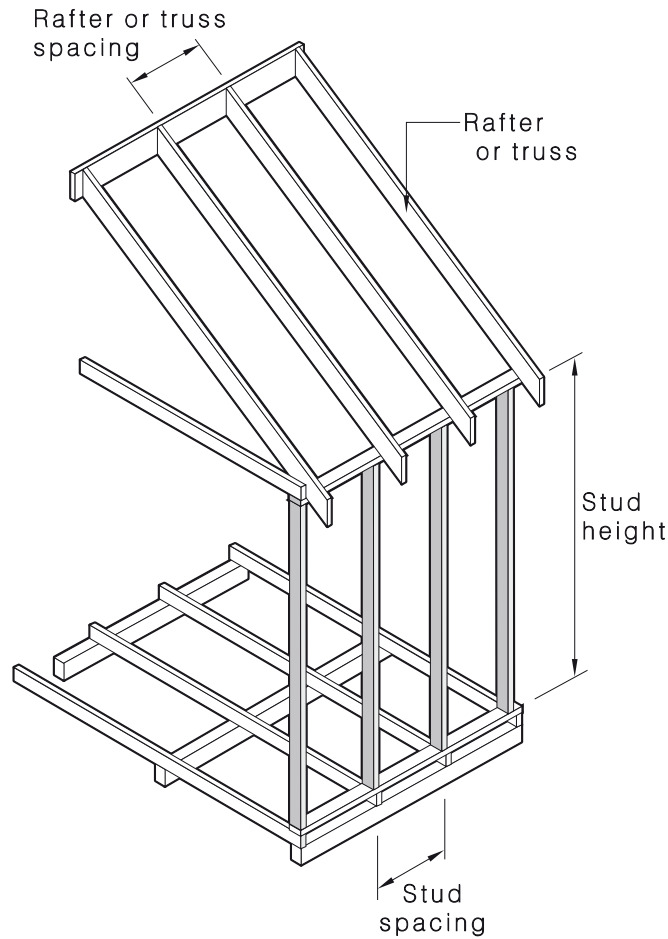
COMMON STUDS—SINGLE OR UPPER STOREY
